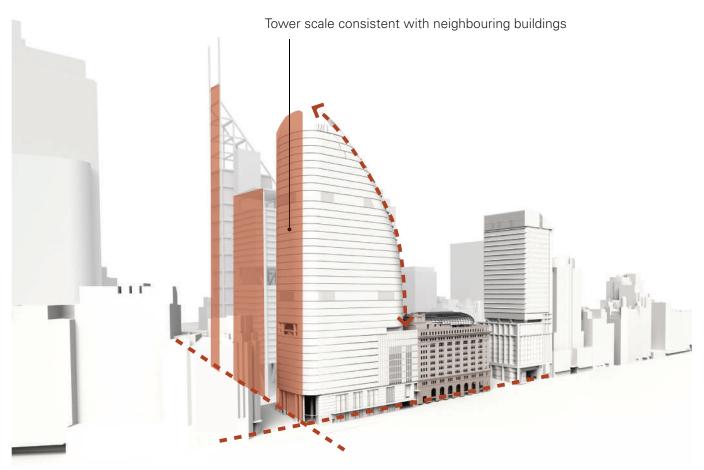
Hunter Street and Castlereagh Street consistency with predominant street alignments and separation from low scale 50 Martin Place building
